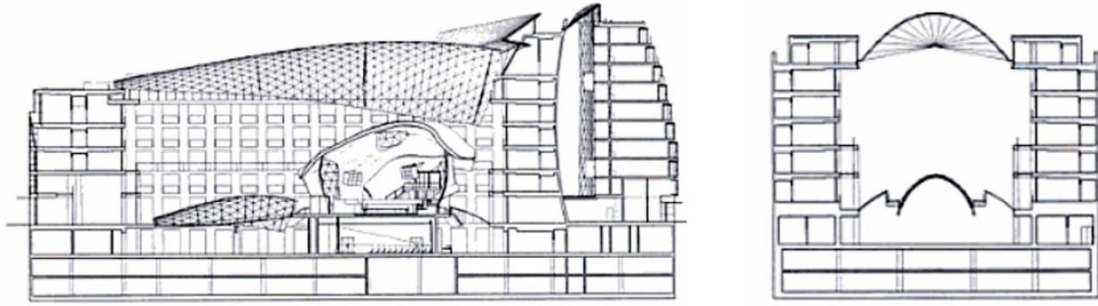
51. Longitudinal and cross section of the grid roof, DZ Bank Building, Berlin, Germany, Frank Gehry & Associates (Source: Myerson, Ross, 2003)
